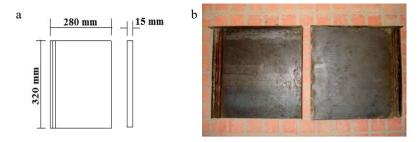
(a) Tile Specimen dimensions,(b)Tile Moulds with cover
